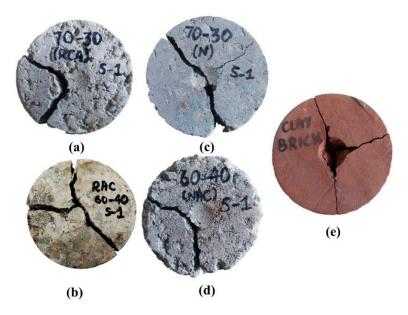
Failure mode of bricks under impact test (a) RAC-70C30F brick (b) RAC-60C40F brick (c) NAC-70C30F brick (d) NAC-60C40F brick (e) Burnt clay brick.
